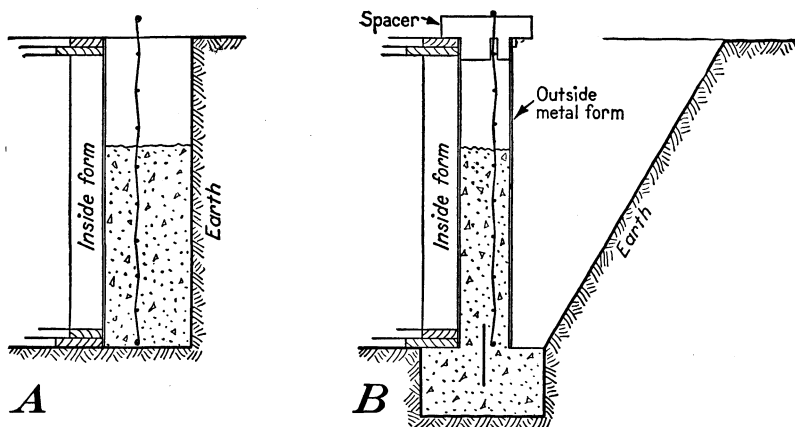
A, Method of constructing foundations without footings for silos with pits in firm soils; B, method used for silos with pits when footings are required.
